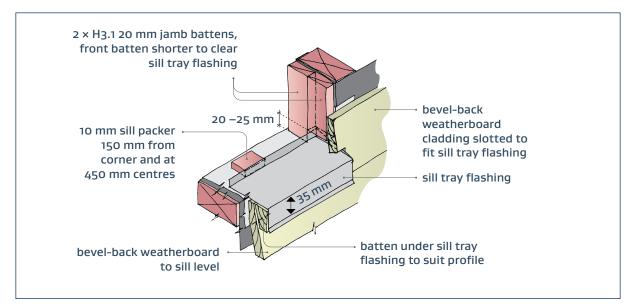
Installing sill tray flashing for direct-fixed wall cladding
